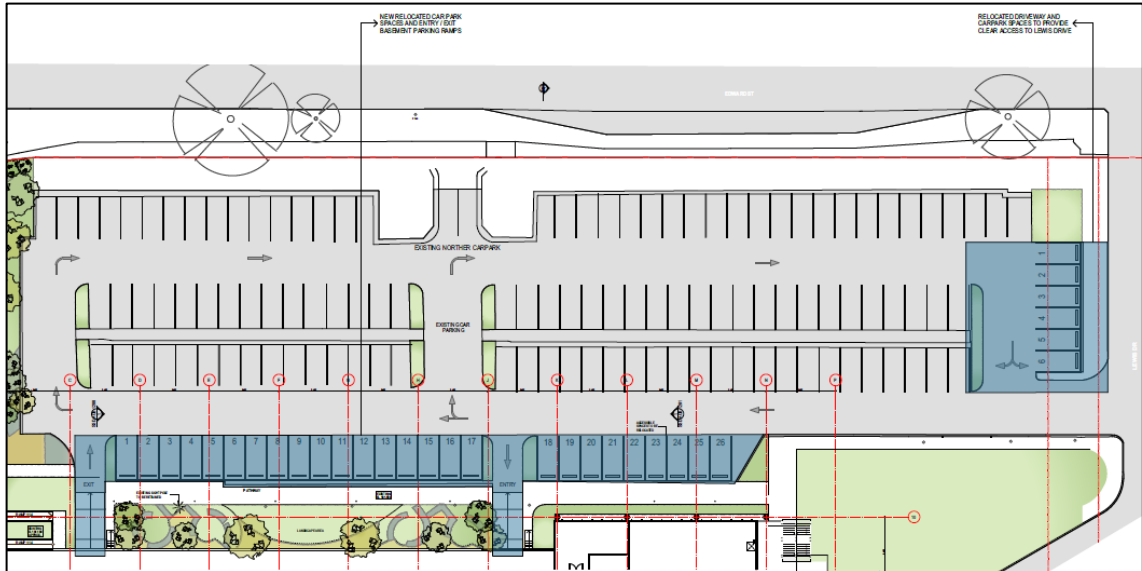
Proposed reinstated car parking spaces under existing demountable building (south of CP3)
